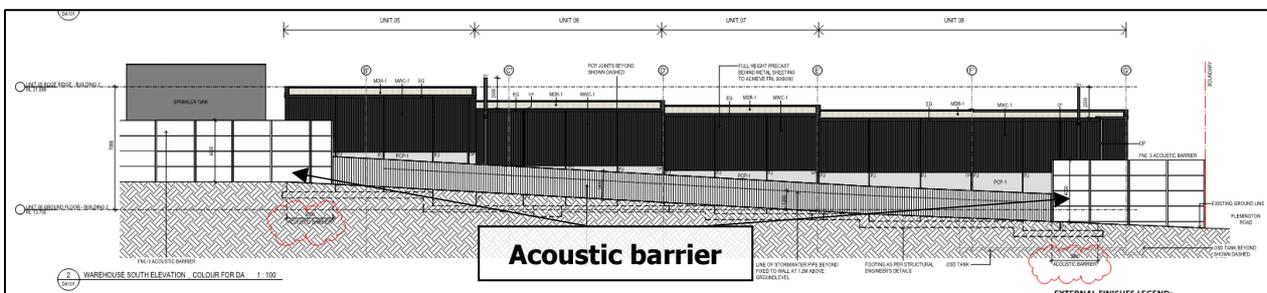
Proposed acoustic barriers on southern elevation (SBA Architects 2021)
